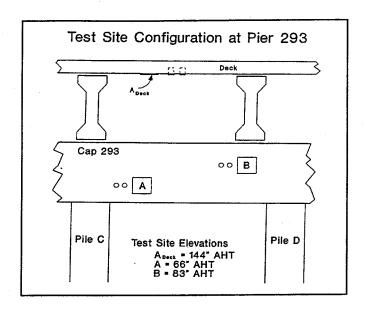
Test site configurations, Pier 293. The squares denote anode test windows; small circles denote location of rebar test probes. Elevations indicated are above high tide (AHT) level.
